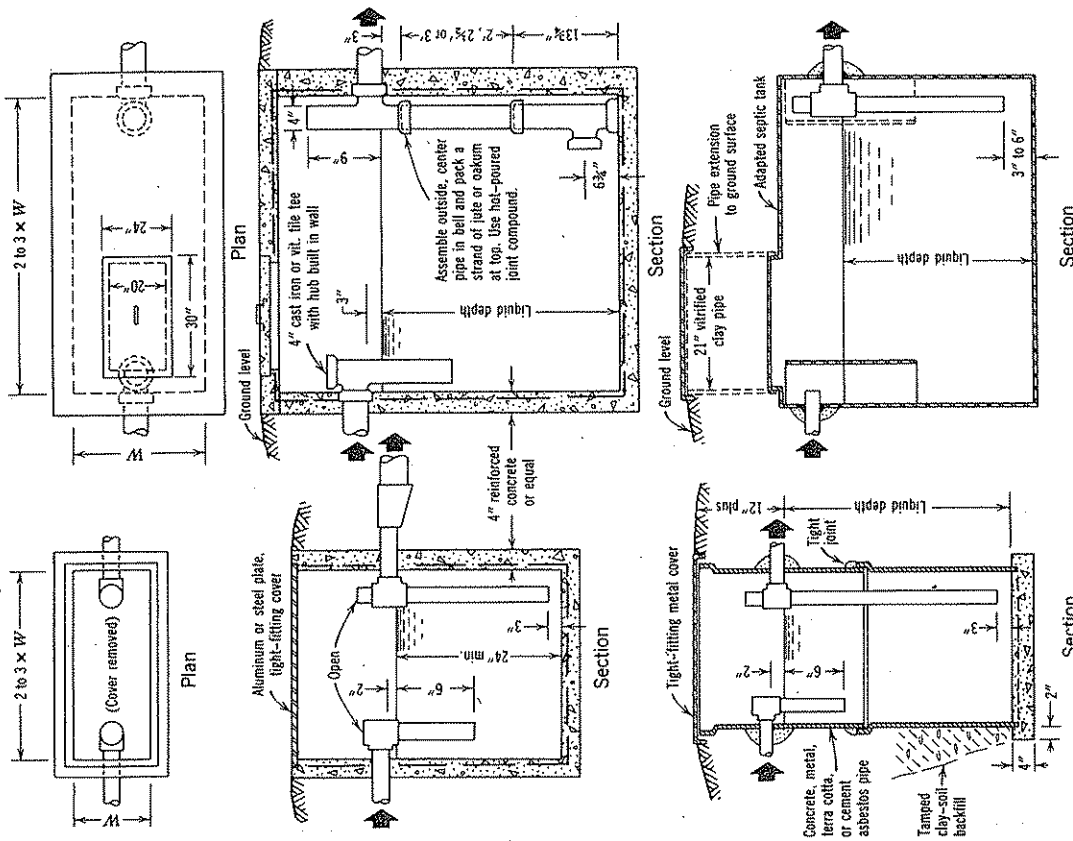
Grease trap details. Manhole over the outlet is also recommended for large tank.
